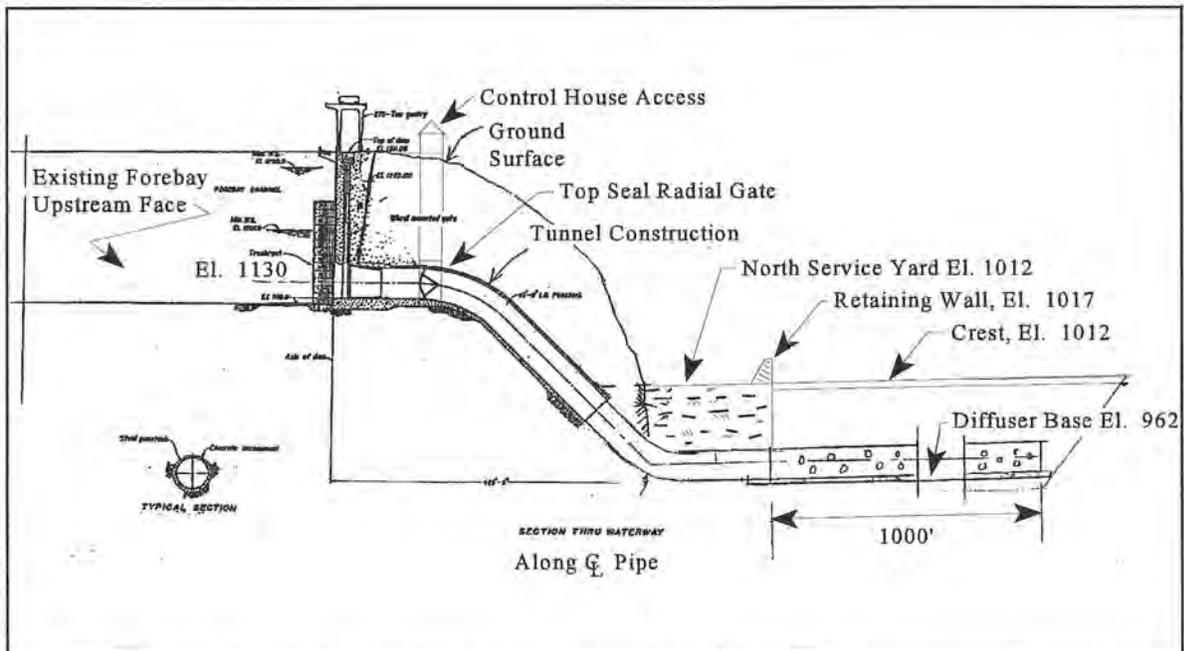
Sectional view along the pipe centerline of the forebay cascade alternative No. 5. (fn:alter#5-3.wpg)
